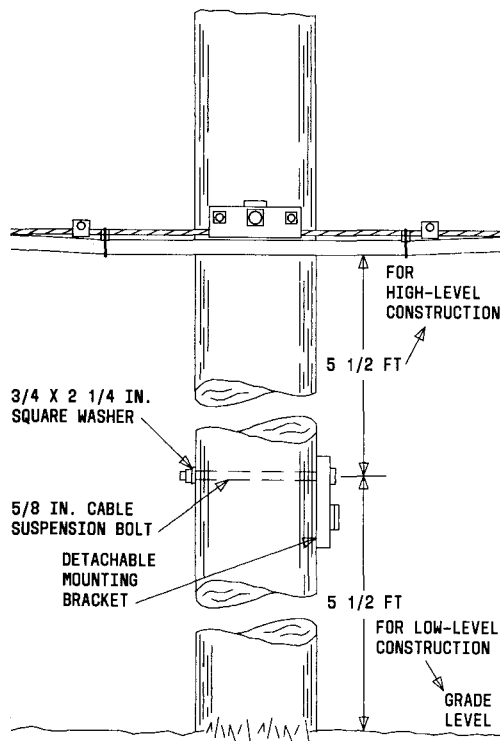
Bolt Detachable Mounting Bracket to Pole or Stub Pole
